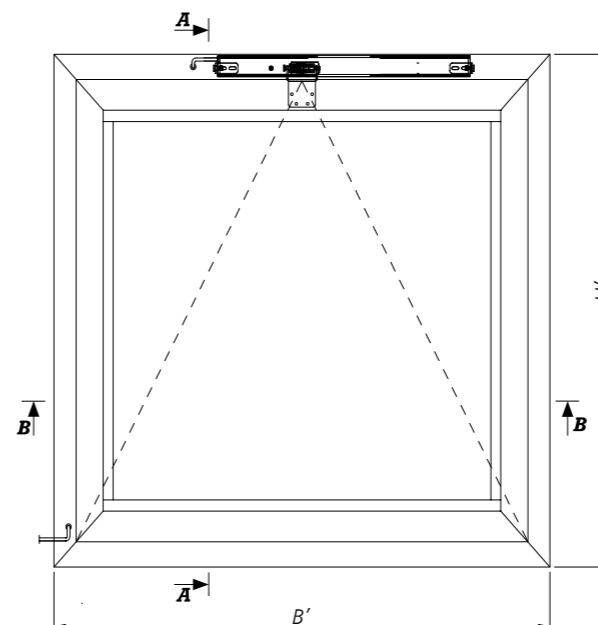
view from inside of the mcr OSO THERM 75 smoke exhaust window with HCV chain actuator in closed position
